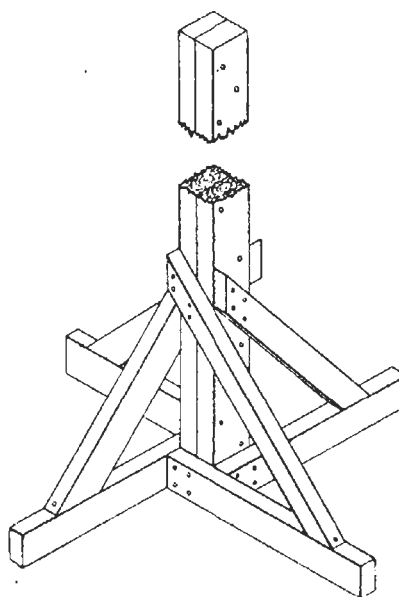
This shows one way to build a sturdy wooden mast for temporary outdoor installations. Be sure to use 2 x 4 timbers. A height of 12 or 14 feet is about the maximum that is practical.
